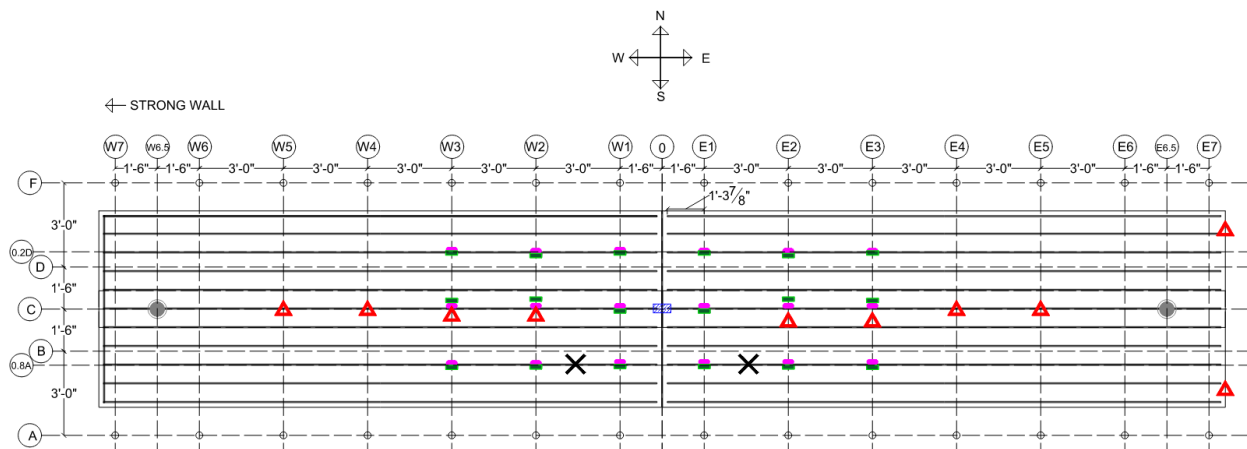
Concept D Instrumentation Plan (Plan View).
